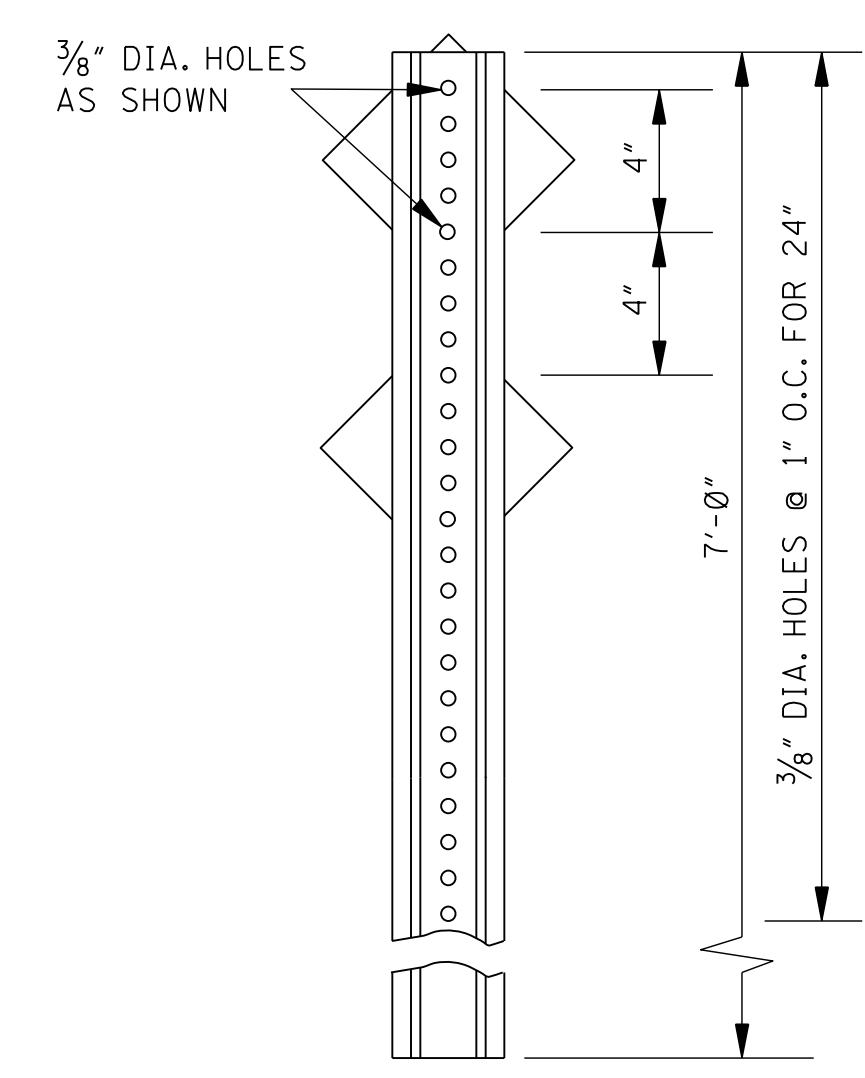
OBJECT MARKER INSTALLATION
